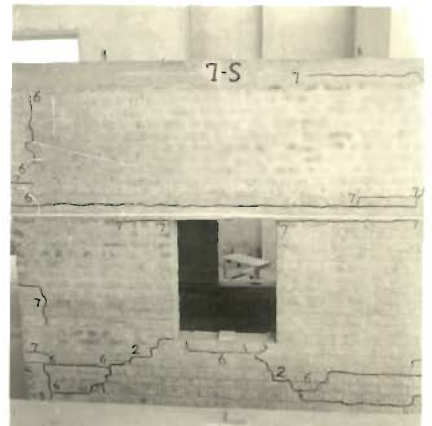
\_ MAINLY HORIZONTAL CRACKS DEVELOPED IN SOUTH WALL DURING SHOCK NO. 7 (MODEL 7)
